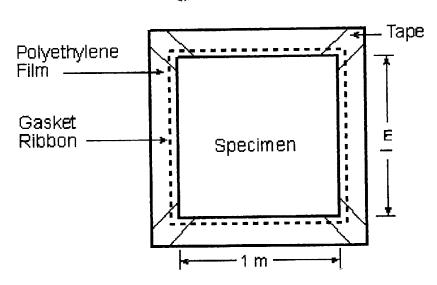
Bottom View of Polyethylene Seal at Double-Perimeter Gaskets on Underside of Rigid Specimen or Open Mesh/Screen for Flexible Sheet Specimen Set-up
